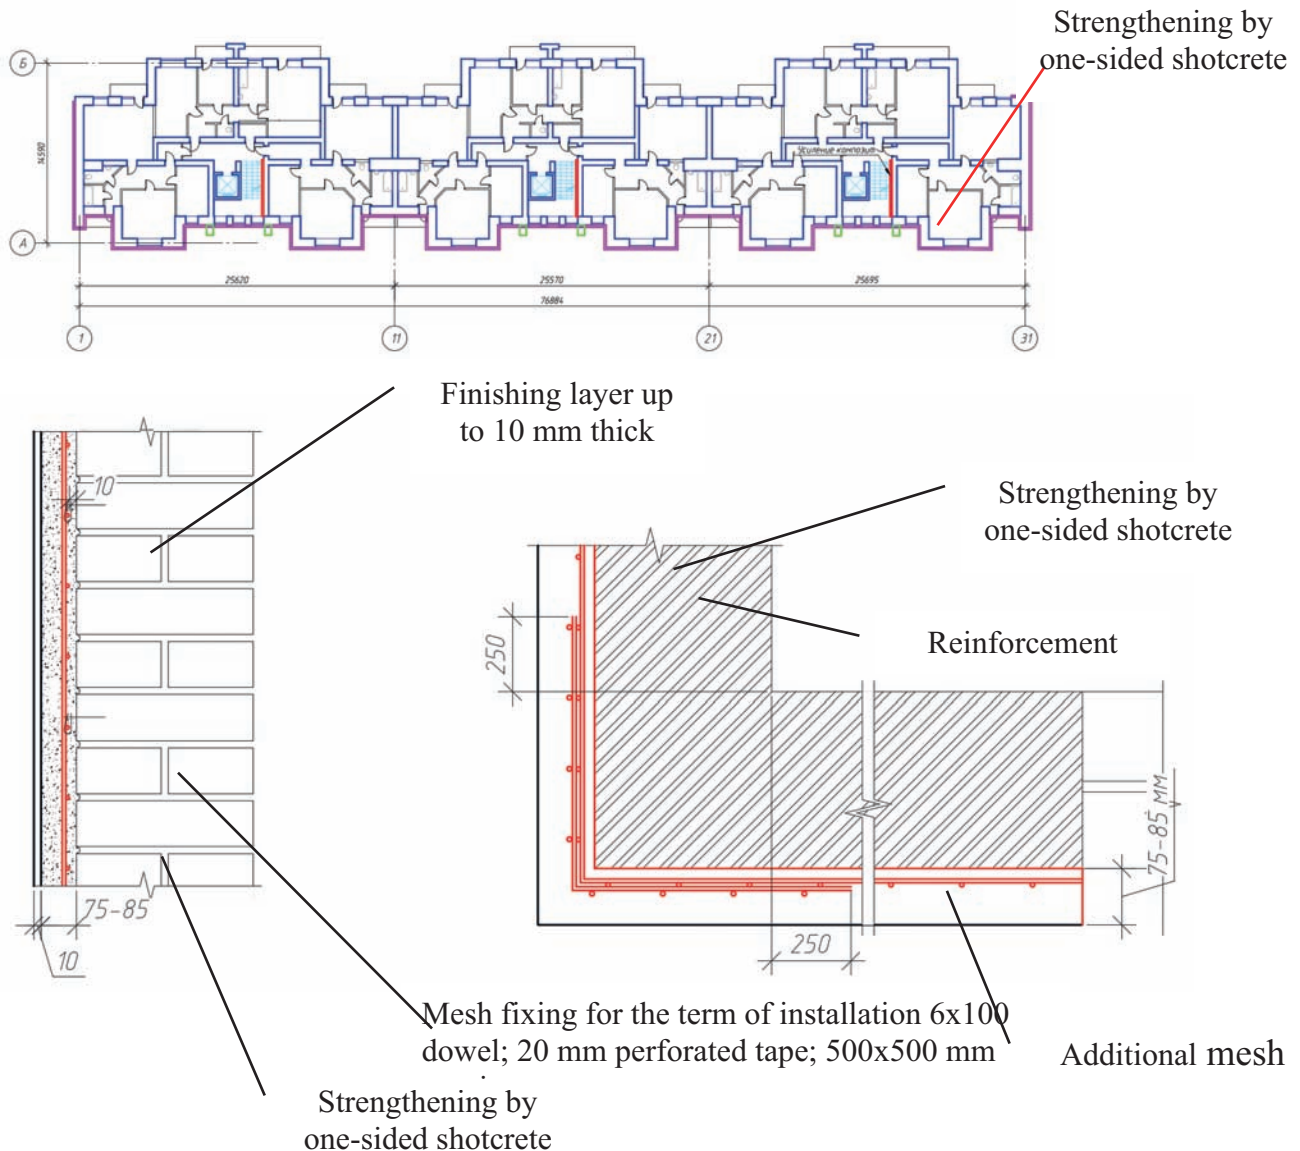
Key structural solutions aimed at strengthening bearing masonry walls
